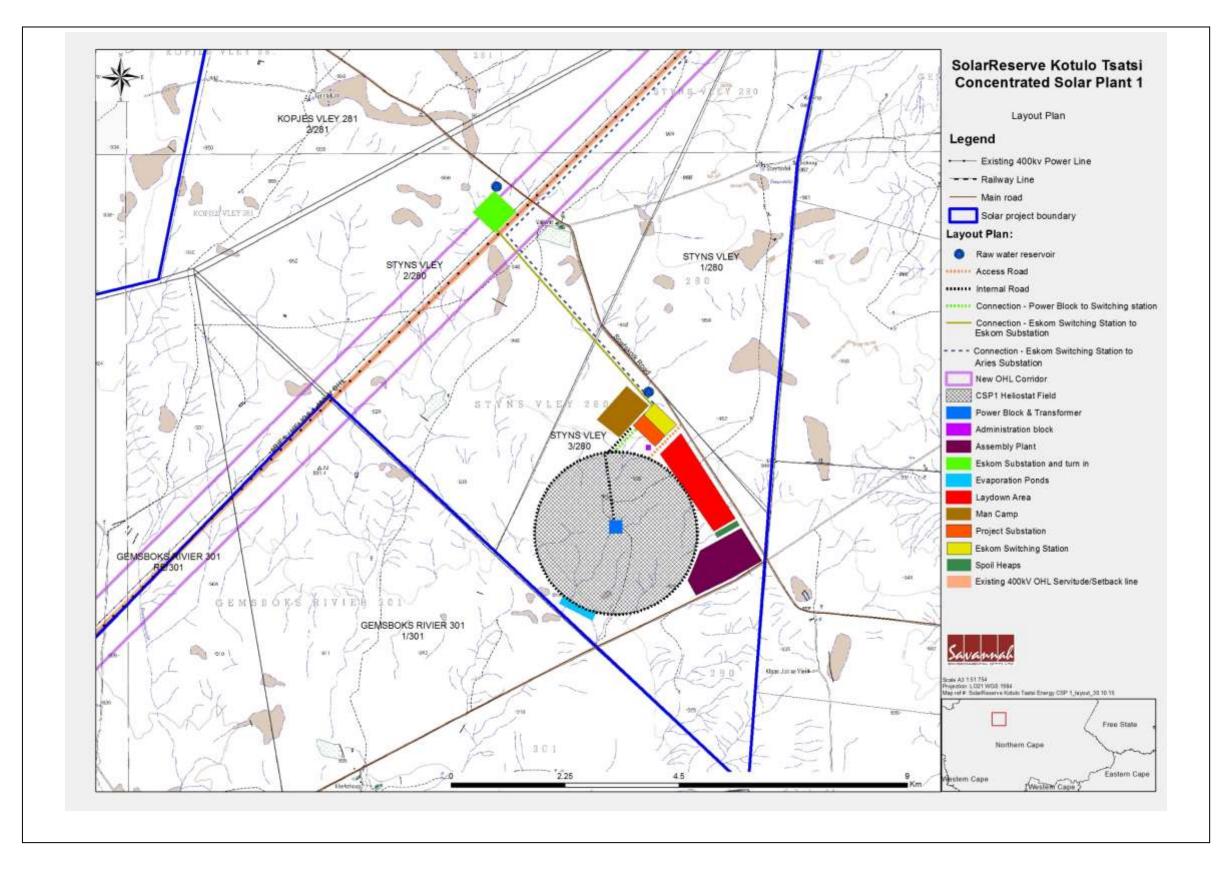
Layout Plan of the proposed CSP 1 project and associated infrastructure
